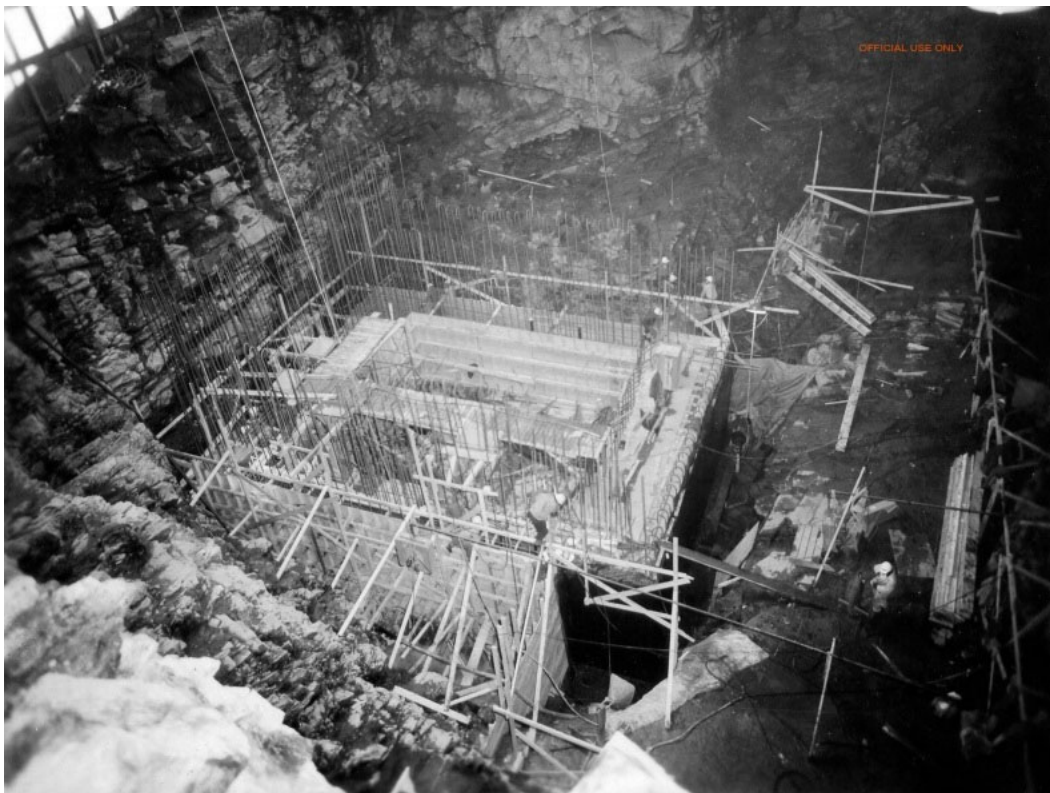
NPD Powerhouse Excavation, Looking East.
